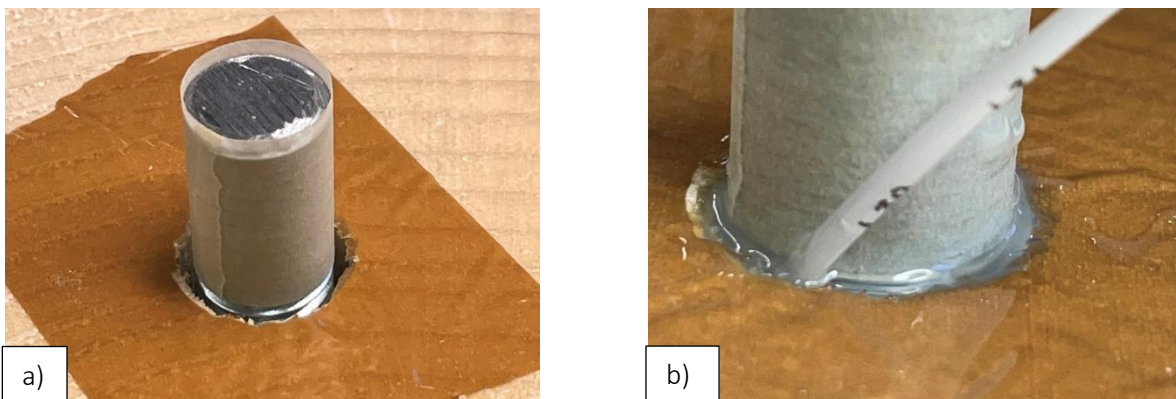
Manufacture of glued-in rod embedment joints a) prepared M16 rod in drill hole, b) adhesive filling process with syringe
